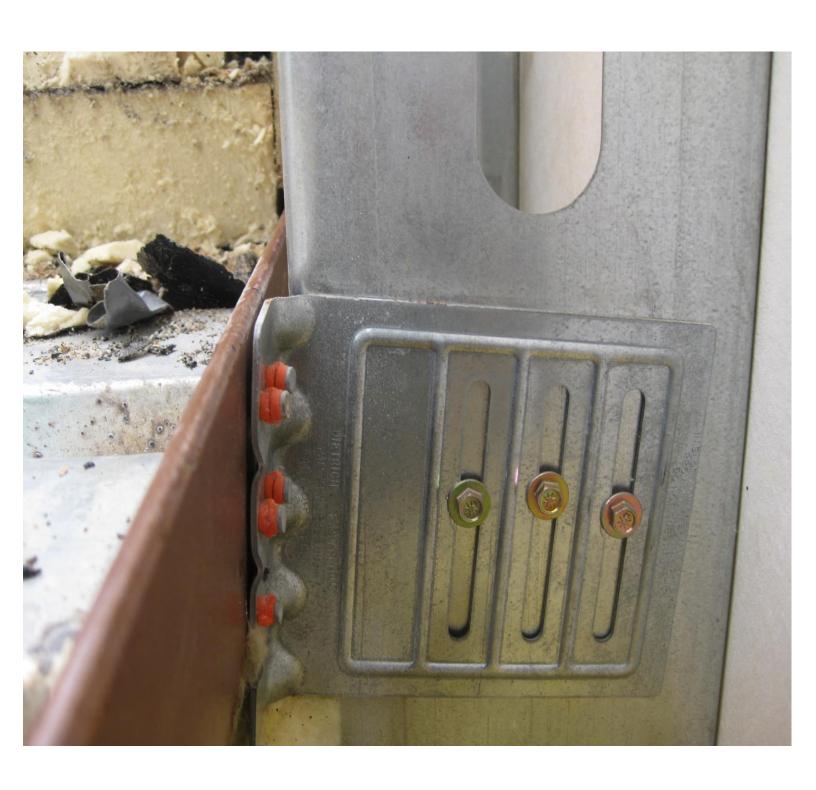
Fasteners have not penetrated the edge angle as required for proper installation.
